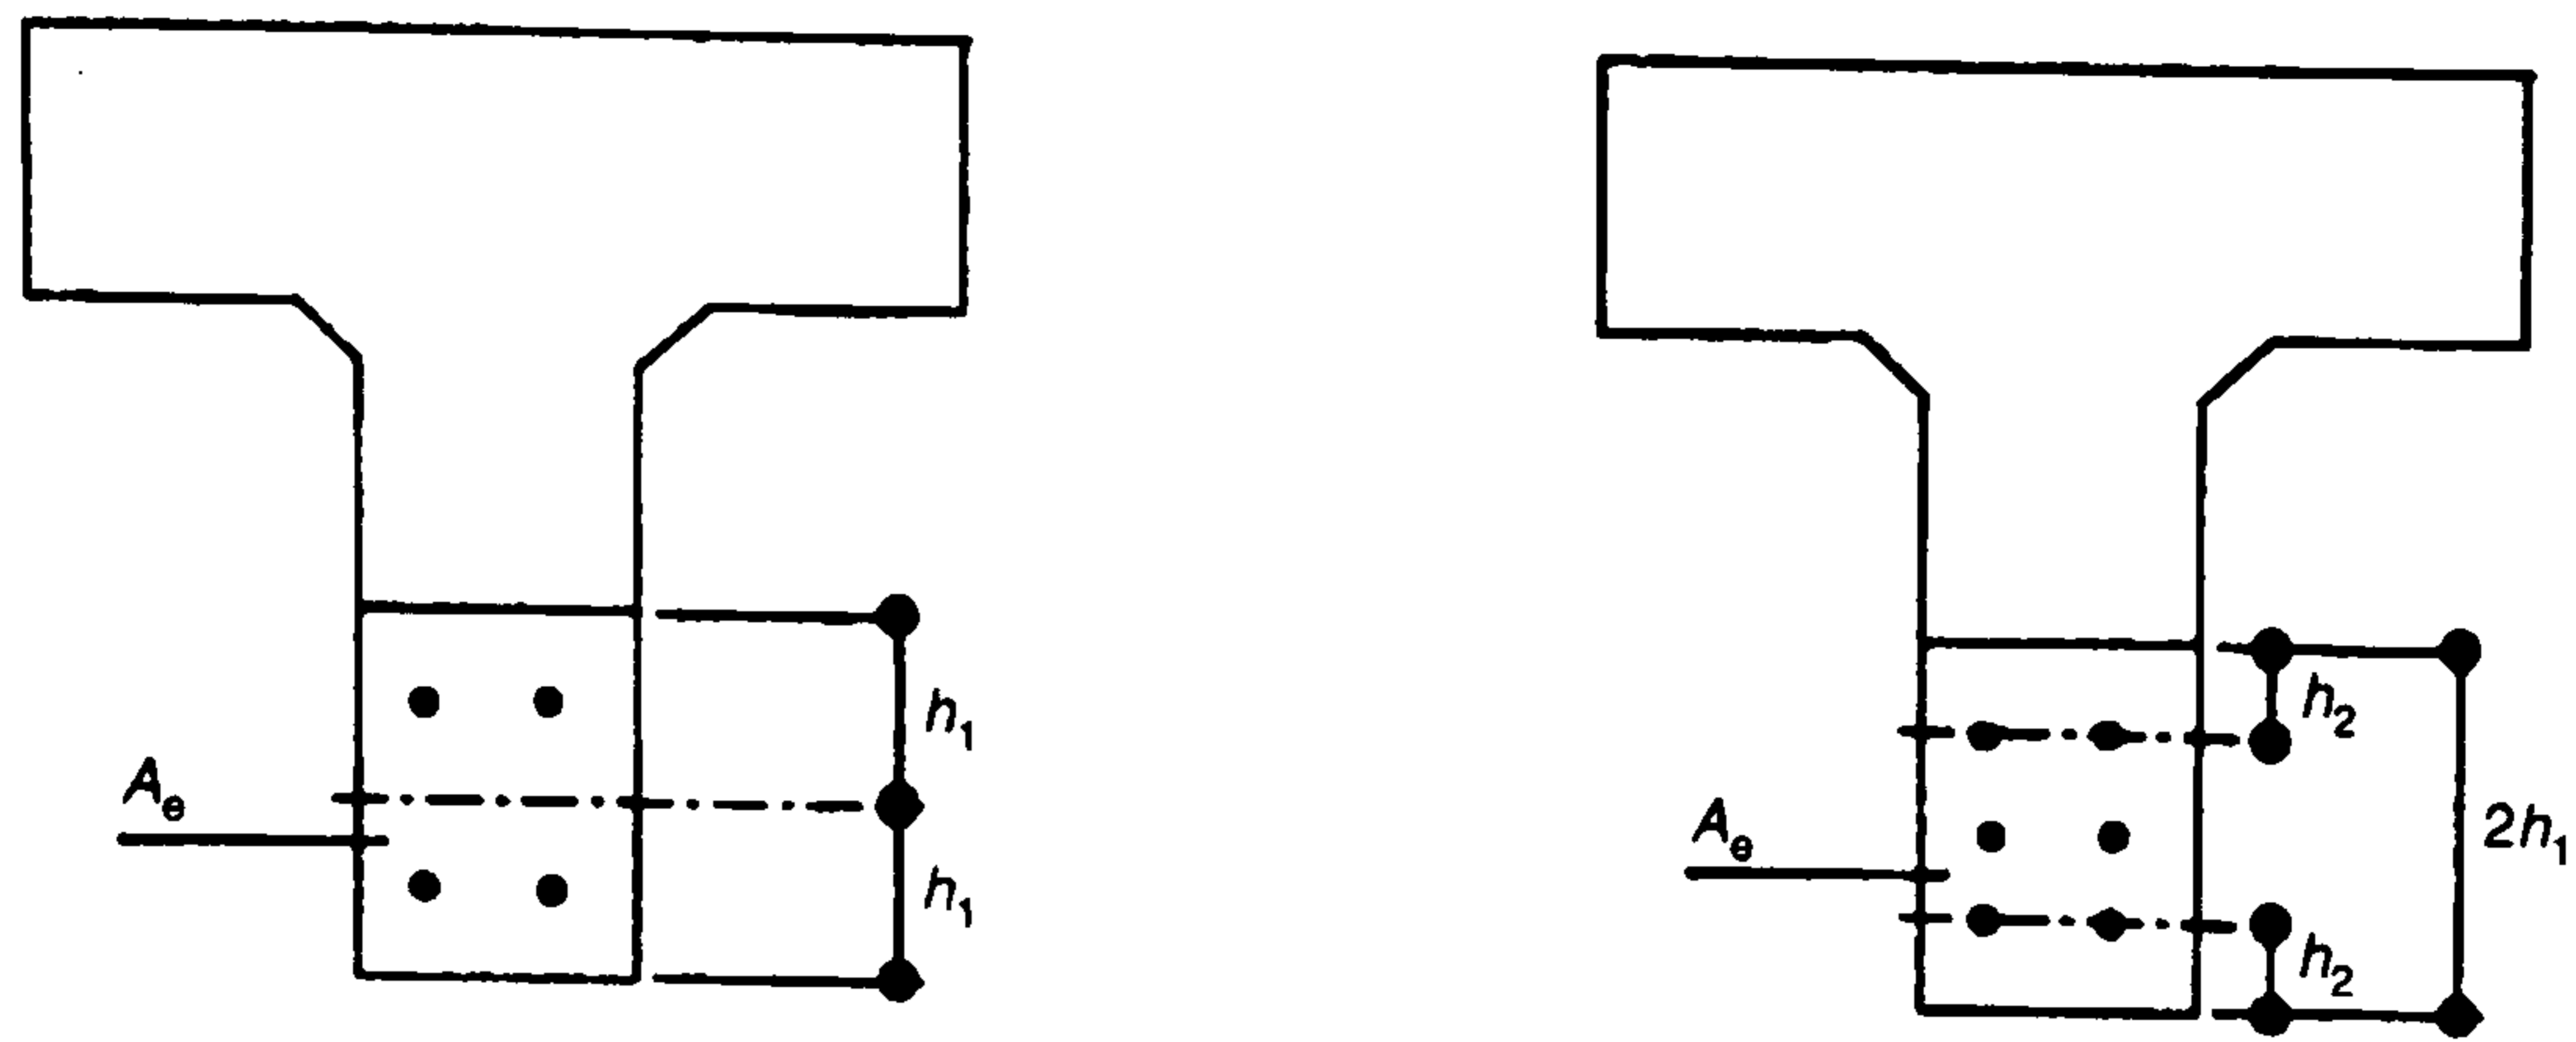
Assumed concrete area in tension, Zhang *et al.* (1995)⁷⁷; a) two layers of steel reinforcement and; b) Three layers of steel reinforcement
